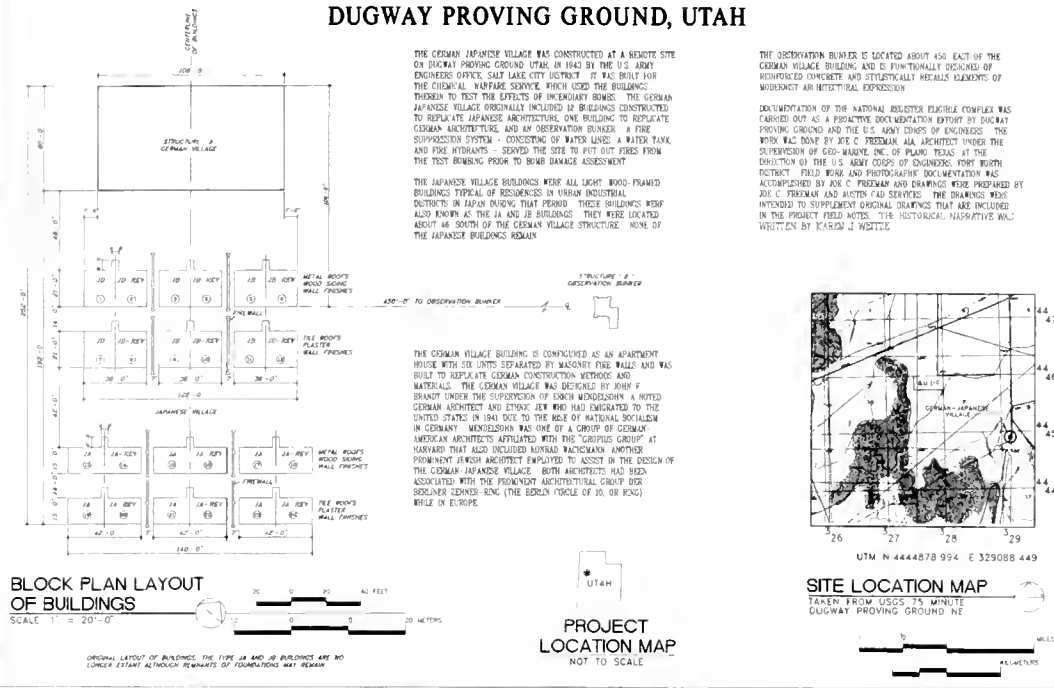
Site Plan of German and Japanese Village, Dugway Proving Ground
